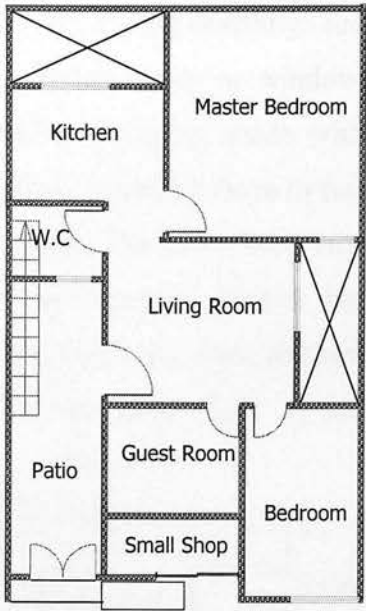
2 Example of a Kerdasa House (ground floor).
